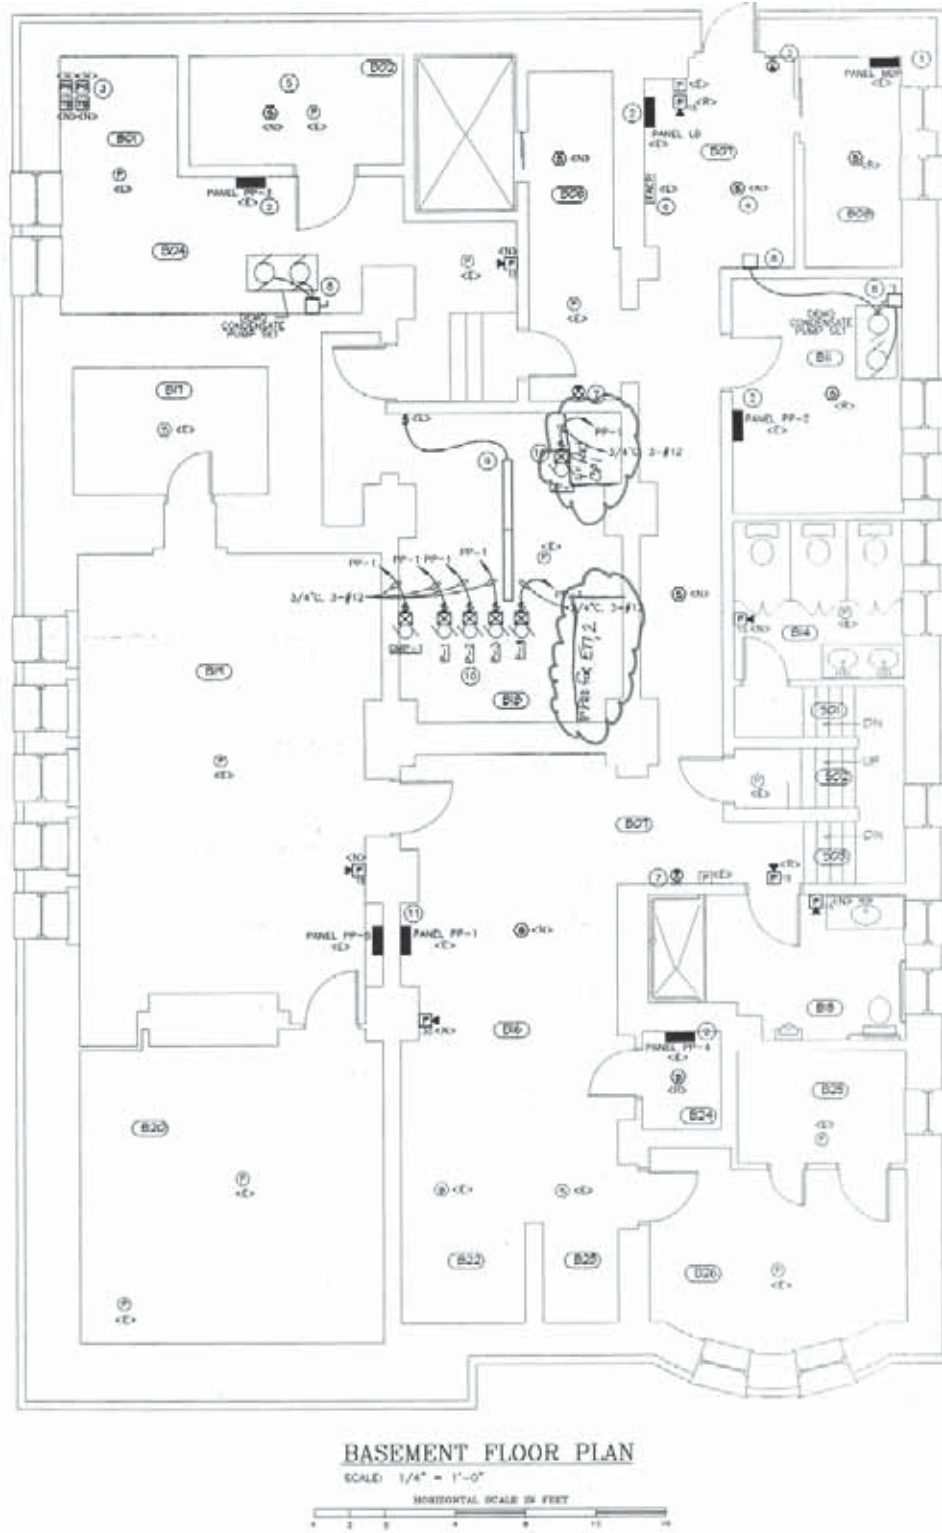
Plan from September 2004 Mechanical Systems Improvements; Plan E1 (N.T.S.)
